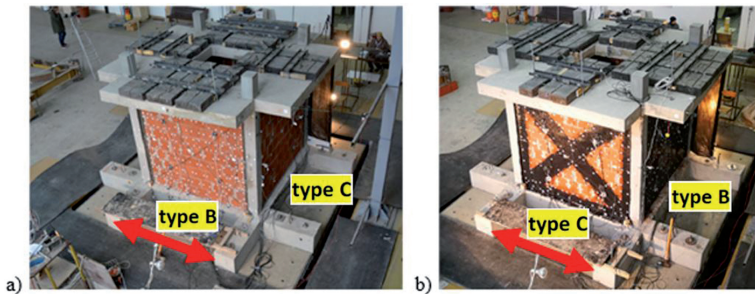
The building with PUFJ and FRPU implemented infill walls on the shake table: Phase I – B (in-plane) and C (out-of-plane) (a), Phase IV – B_FRPU (out-of-plane) and C_FRPU (in-plane) (b)
